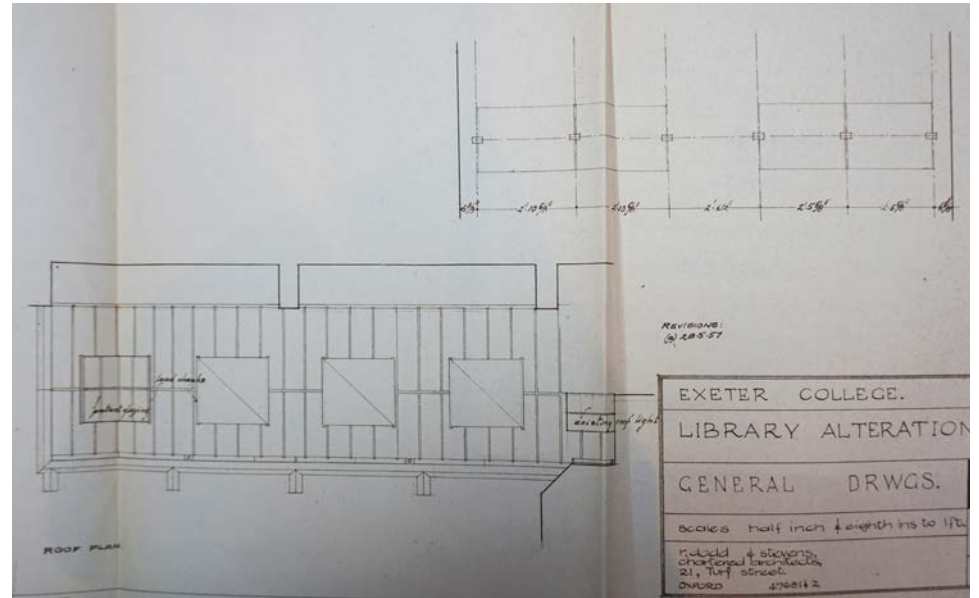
1957 roof plan of the Annex showing the insertion of four new rooflights, Fielding, Dodd and Stevens (Exeter College Archive)
